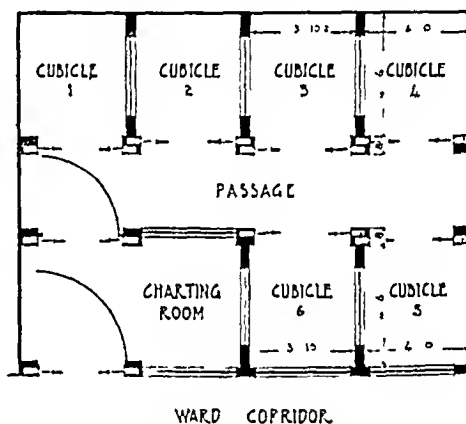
Plan of room equipped with ultraviolet lamps. Arrows show direction of ultraviolet rays.
